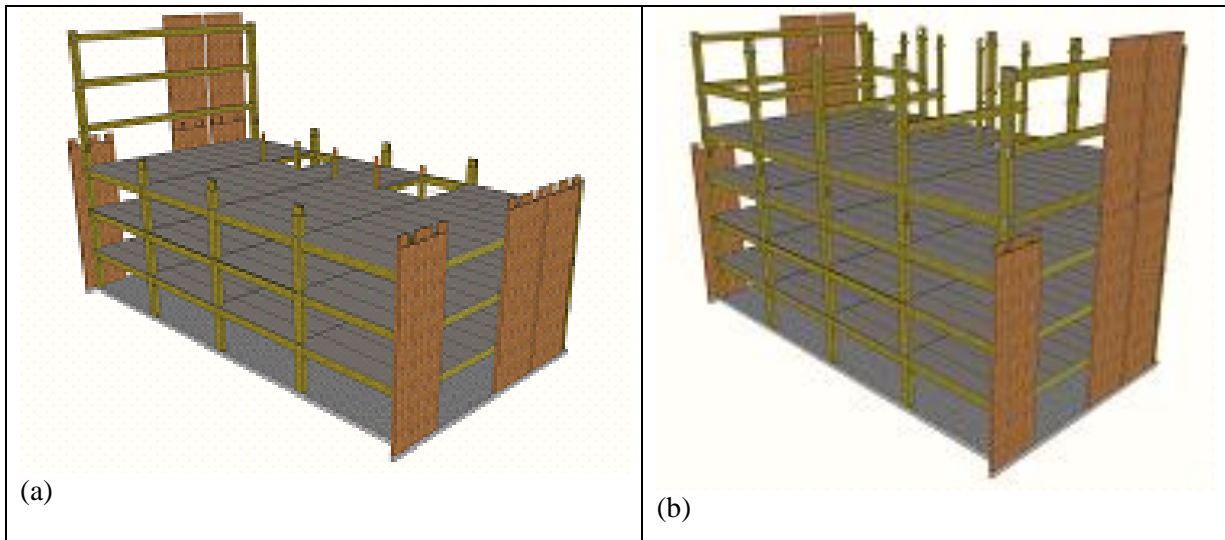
(a) End walls and frames in place (b) Second three storey walls and frame in place.
